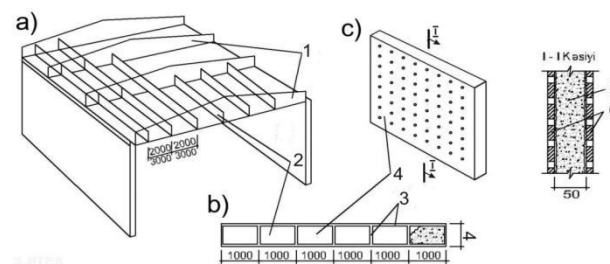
Arrangement and construction of a sound-absorbing beam:
